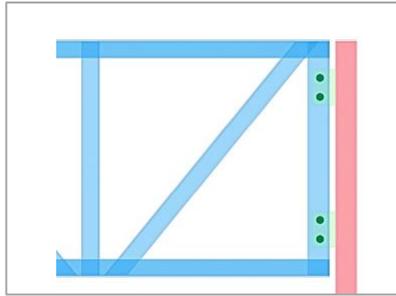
Typical standard SHS/RHS post connection to truss EA end vertical
